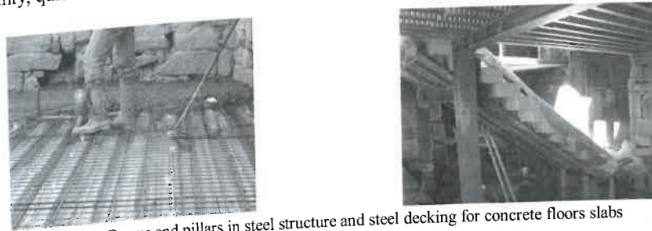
Beams and pillars in steel structure and steel decking for concrete floors slabs
